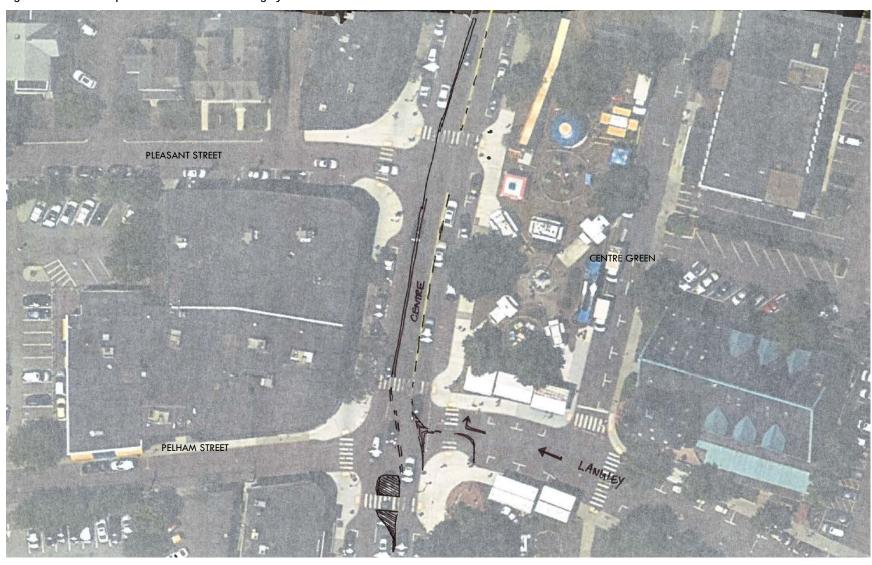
Concept for Centre Street and Langley Road Intersection
